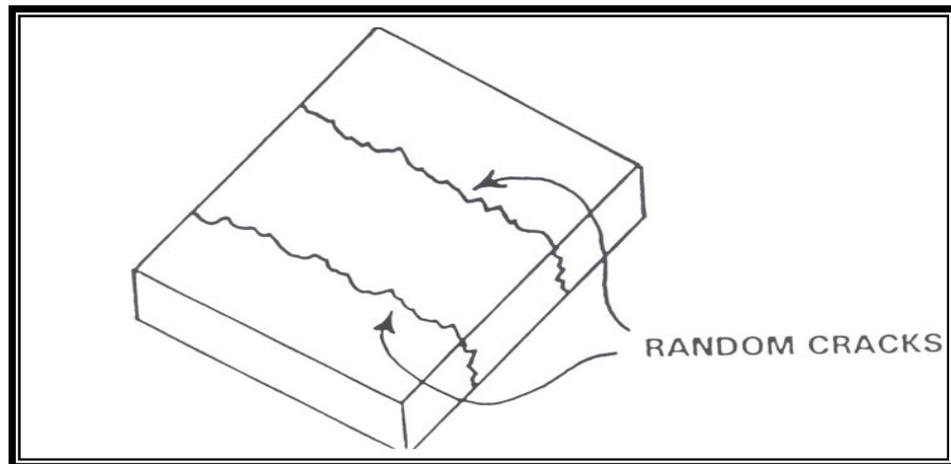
Random Cracks in Plain Concrete Pavement
